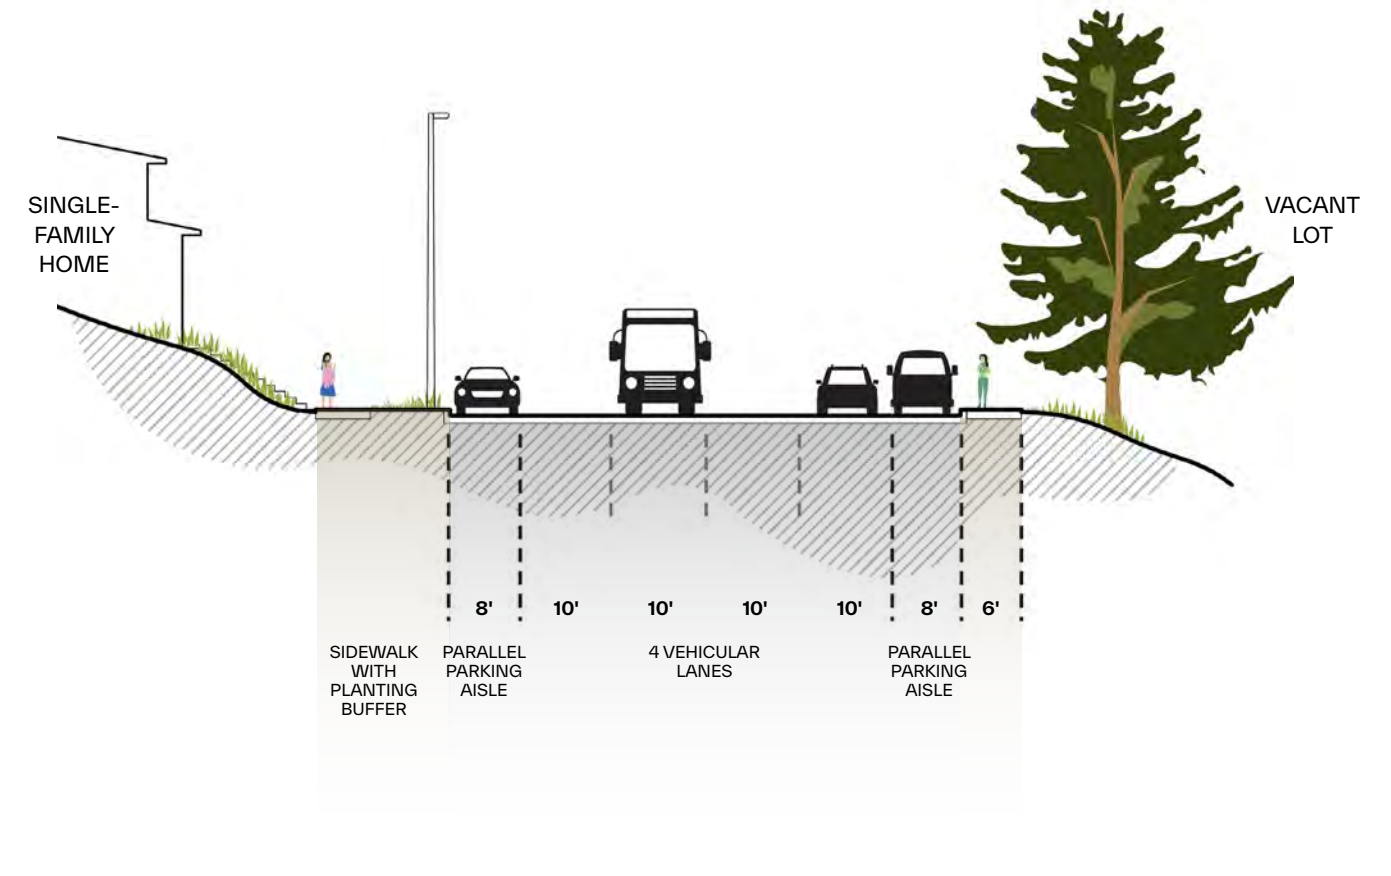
| Existing Street Section of Tacoma Avenue
